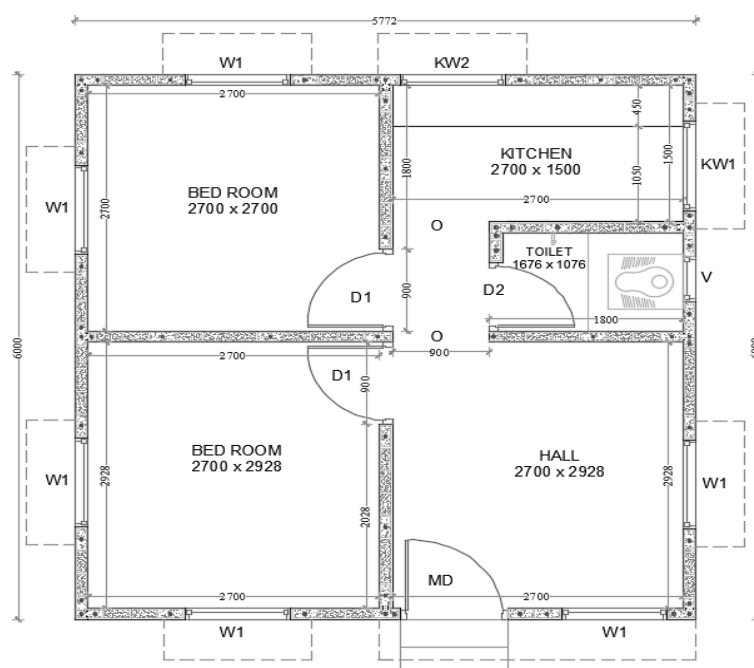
Typical building plan for urban housing with 30 sq.m. plinth area
